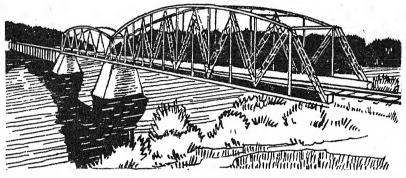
Bridge over R. Dibamba (Central Railway) near Douala
